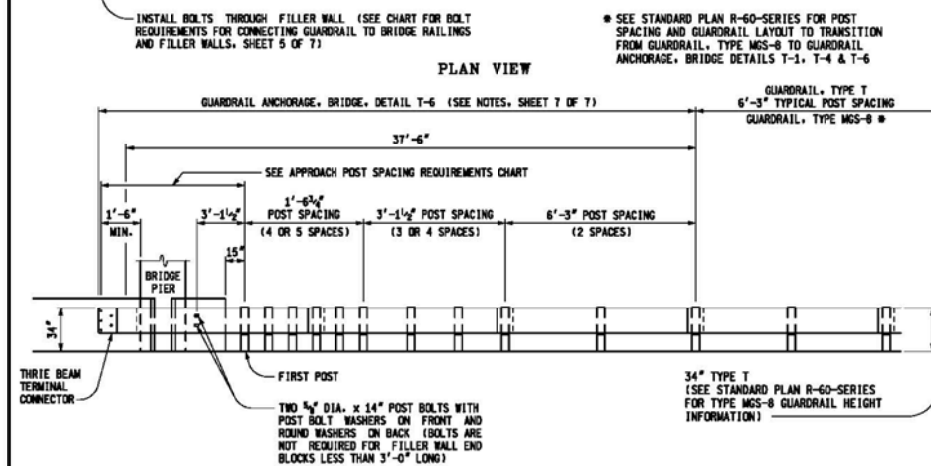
DETAILS FOR CONNECTING GUARDRAIL TO BRIDGE BARRIER RAILINGS, TYPE 4, 2-TUBE, 4-TUBE, AESTHETIC PARAPET TUBE, OR 3 TUBE WITH PICKETS (WITH EXPANSION AT BACKWALL)
